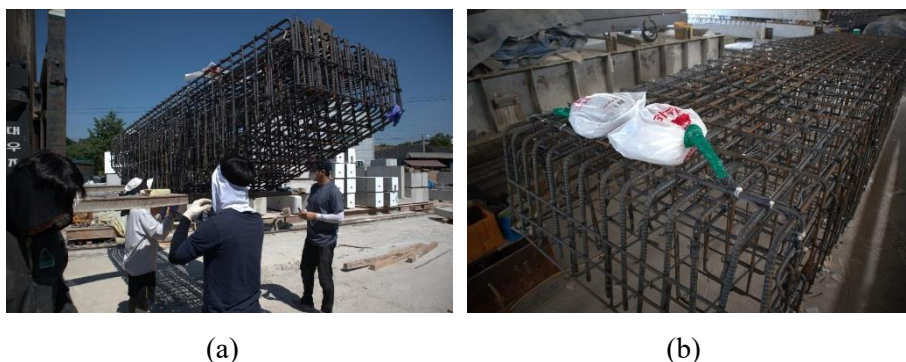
Gauges in pier caps: (a) Installation of steel gauge; (b) Sorting and waterproofing of gauges
